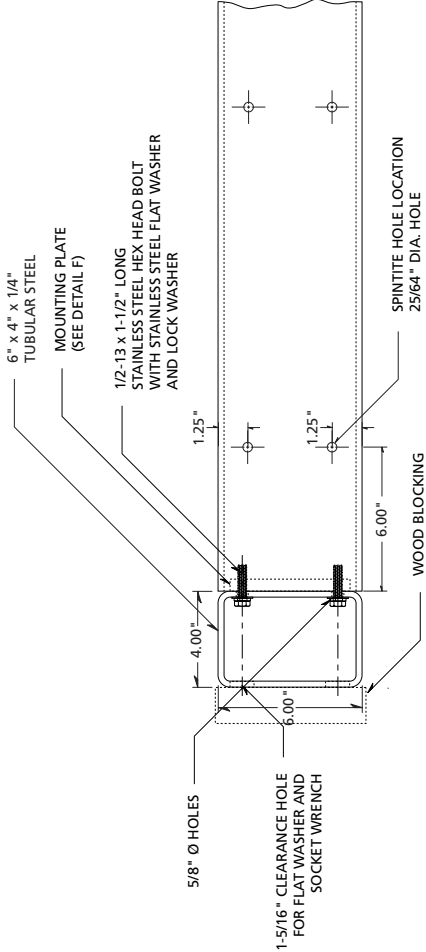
DETAIL E. LOWER WOOD RAIL ASSEMBLY FRONT ELEVATION
